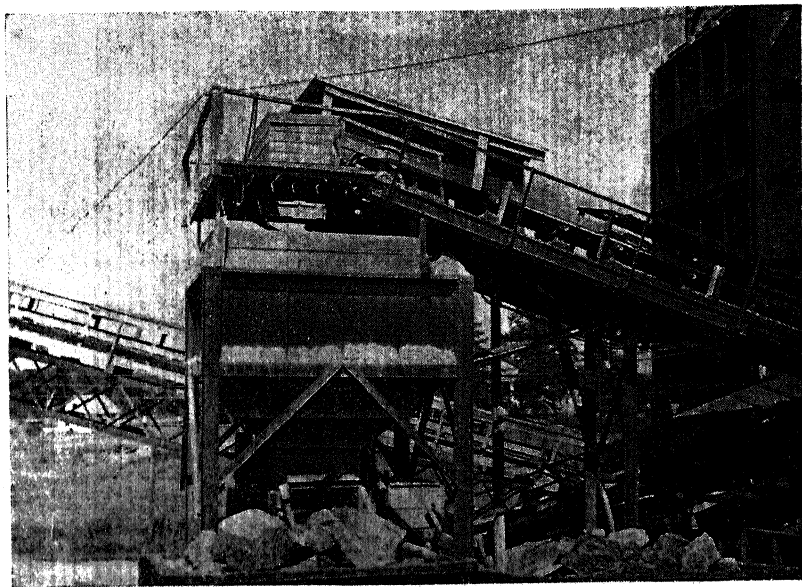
General view of a grading plant showing bins and structures of welded steel construction.
